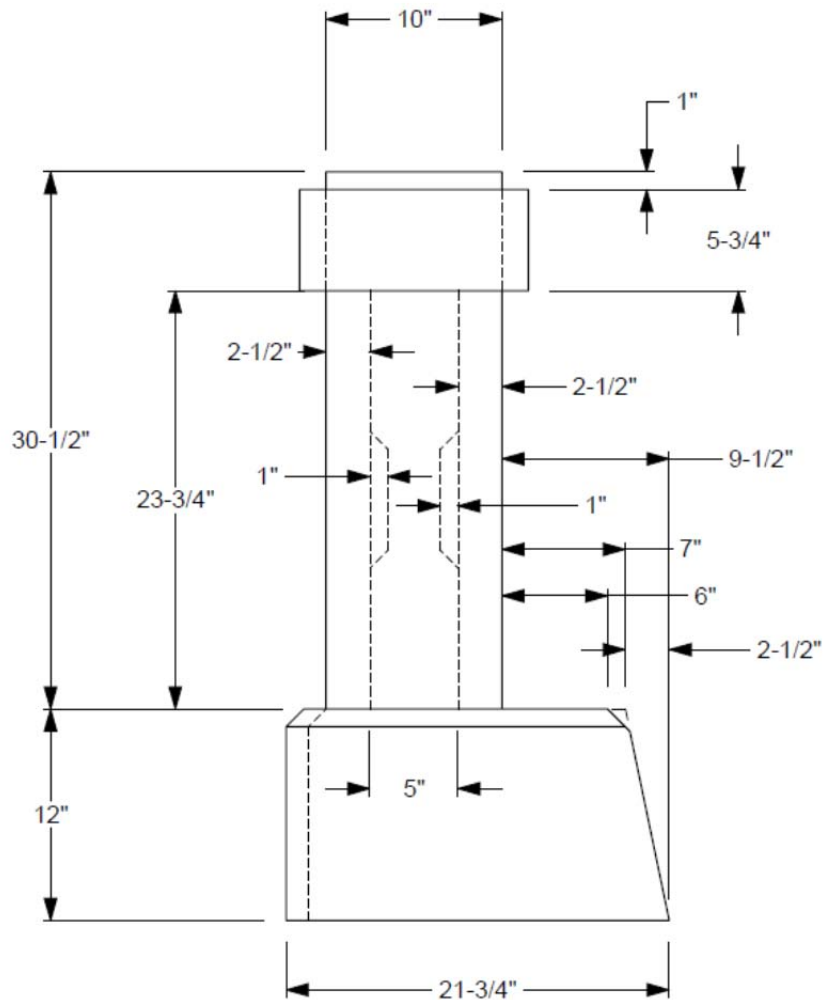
Concrete Rail without Openings Plan and Elevation Views
